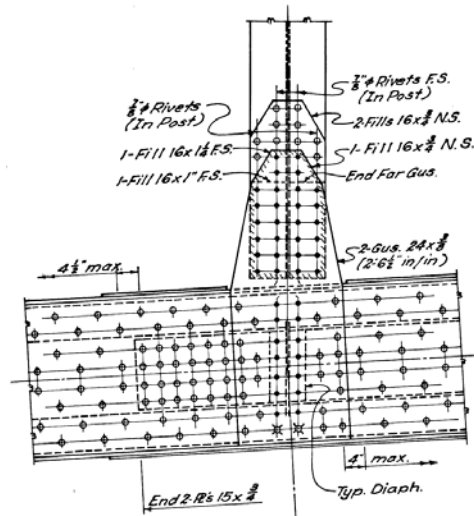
Original gusset plate connecting the vertical truss to the horizontal chord
